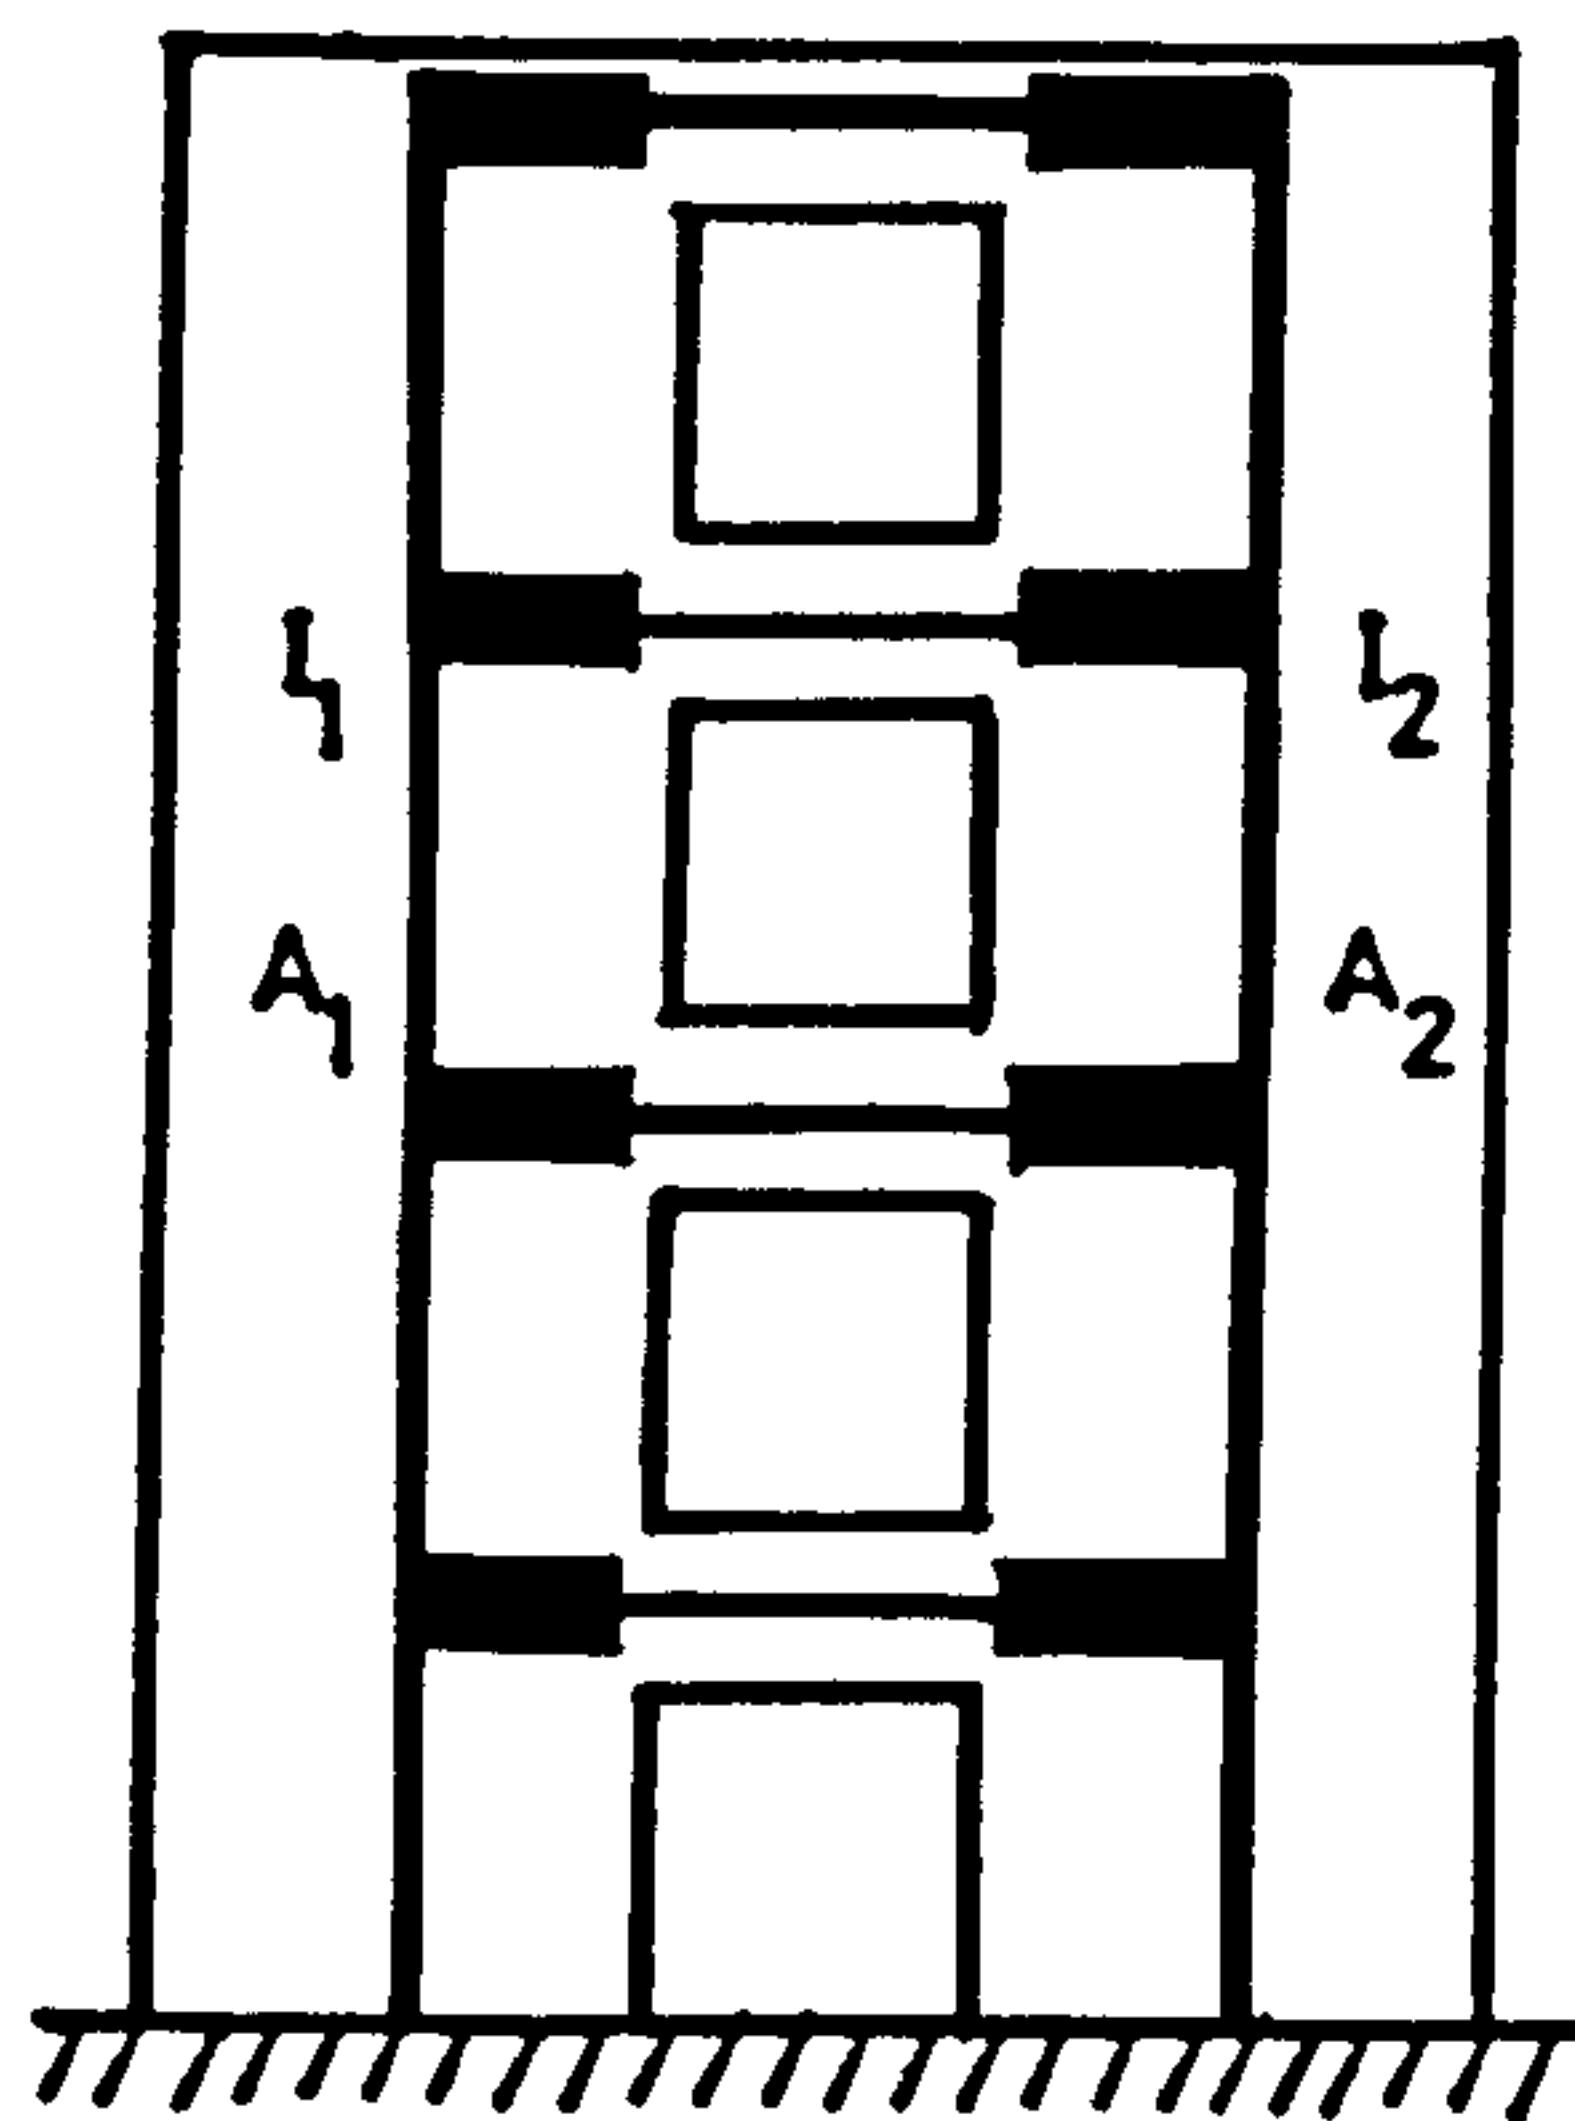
An idealized frame replacing a shear wall containing openings.
